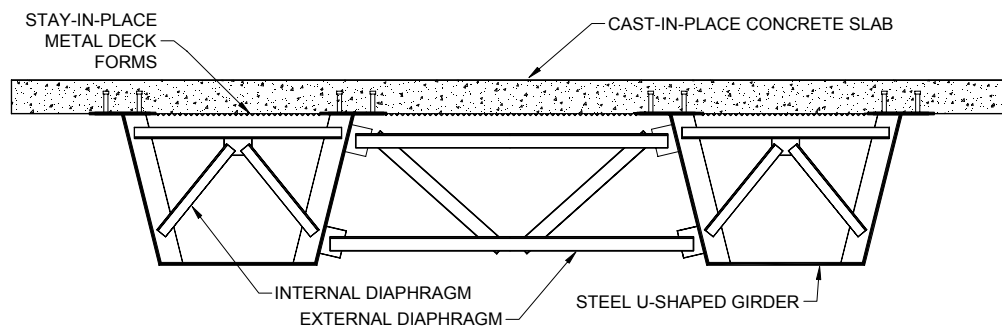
CROSS SECTION OF TRAPEZOIDAL BOX-GIRDER BRIDGE SYSTEM (CHEPLAK, 2001)
